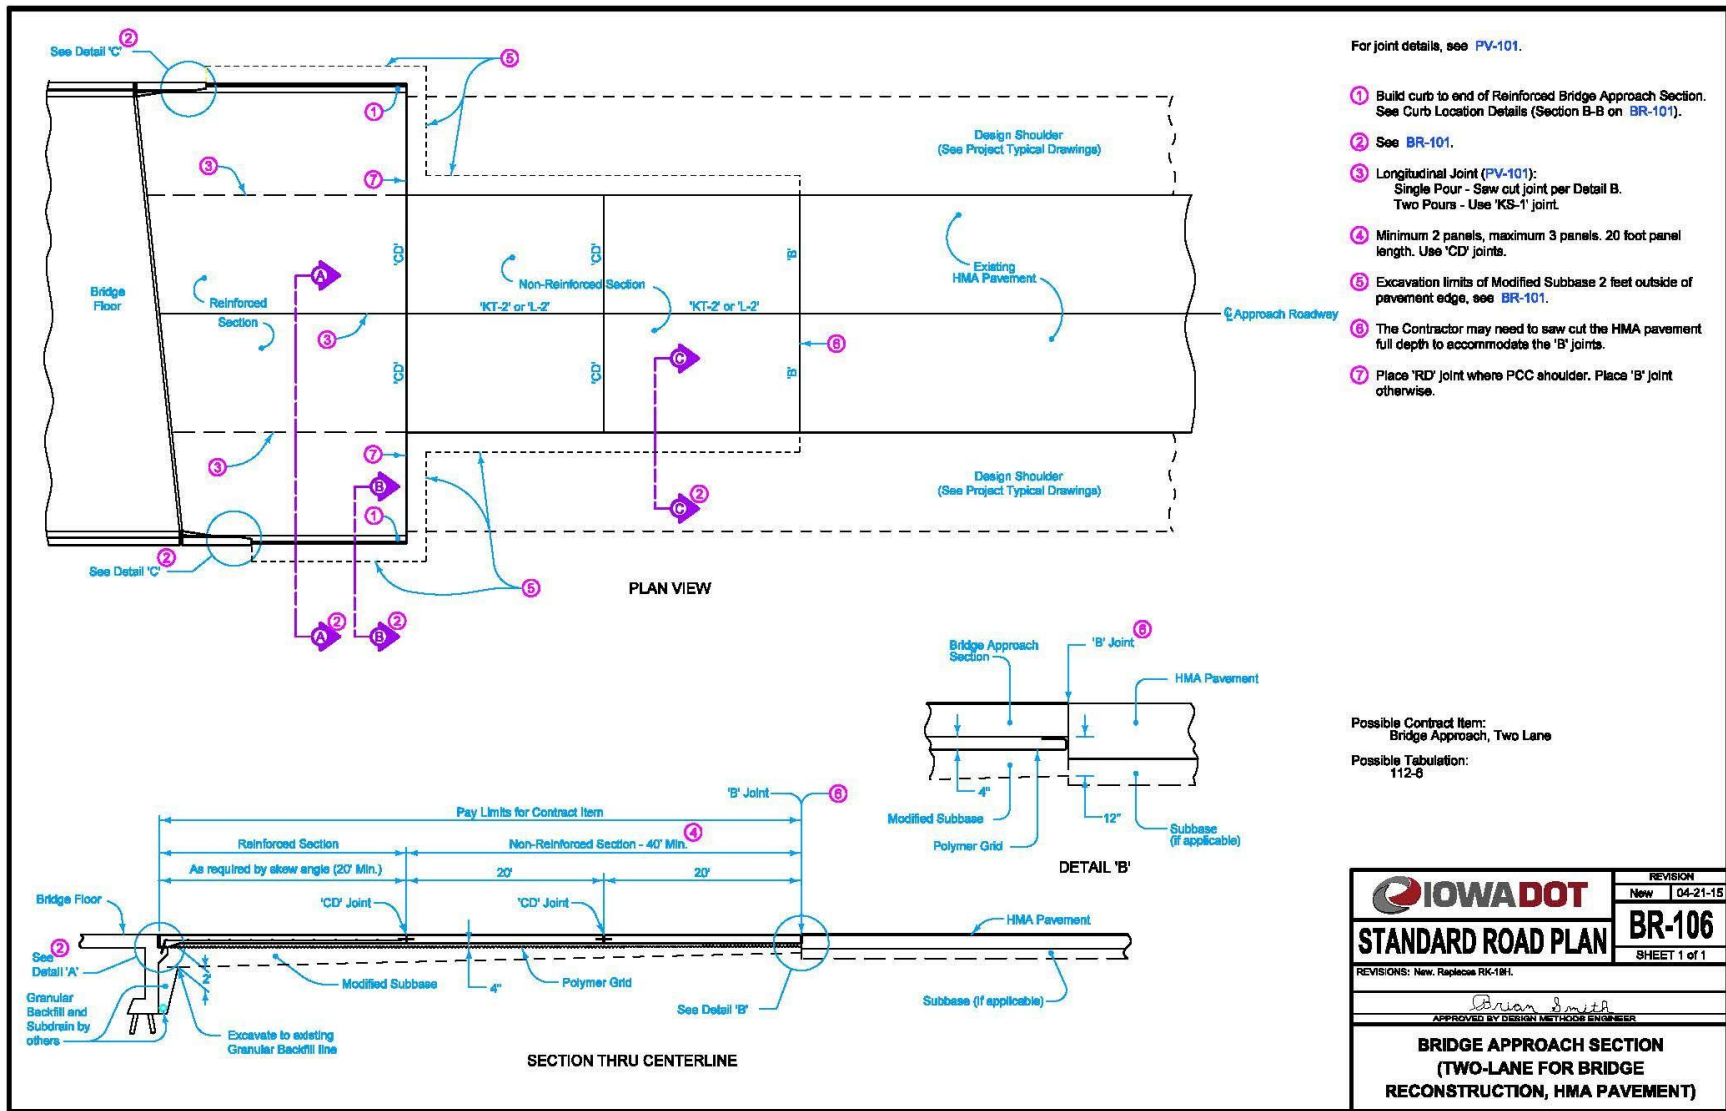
Iowa DOT Standard Road Plan BR-106 – Bridge Approach Section (Two-Lane for Bridge Reconstruction, HMA Pavement) [68]
